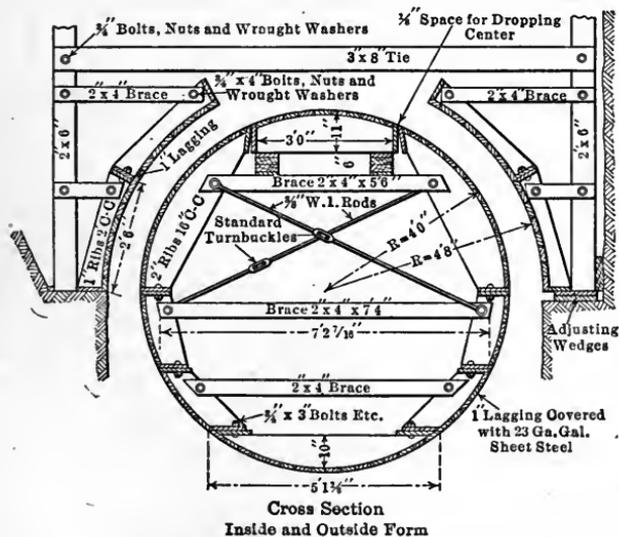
B.—Collapsible inside and outside forms for the construction of Anderson Siphon. Belle Fourche Project, S. D.
